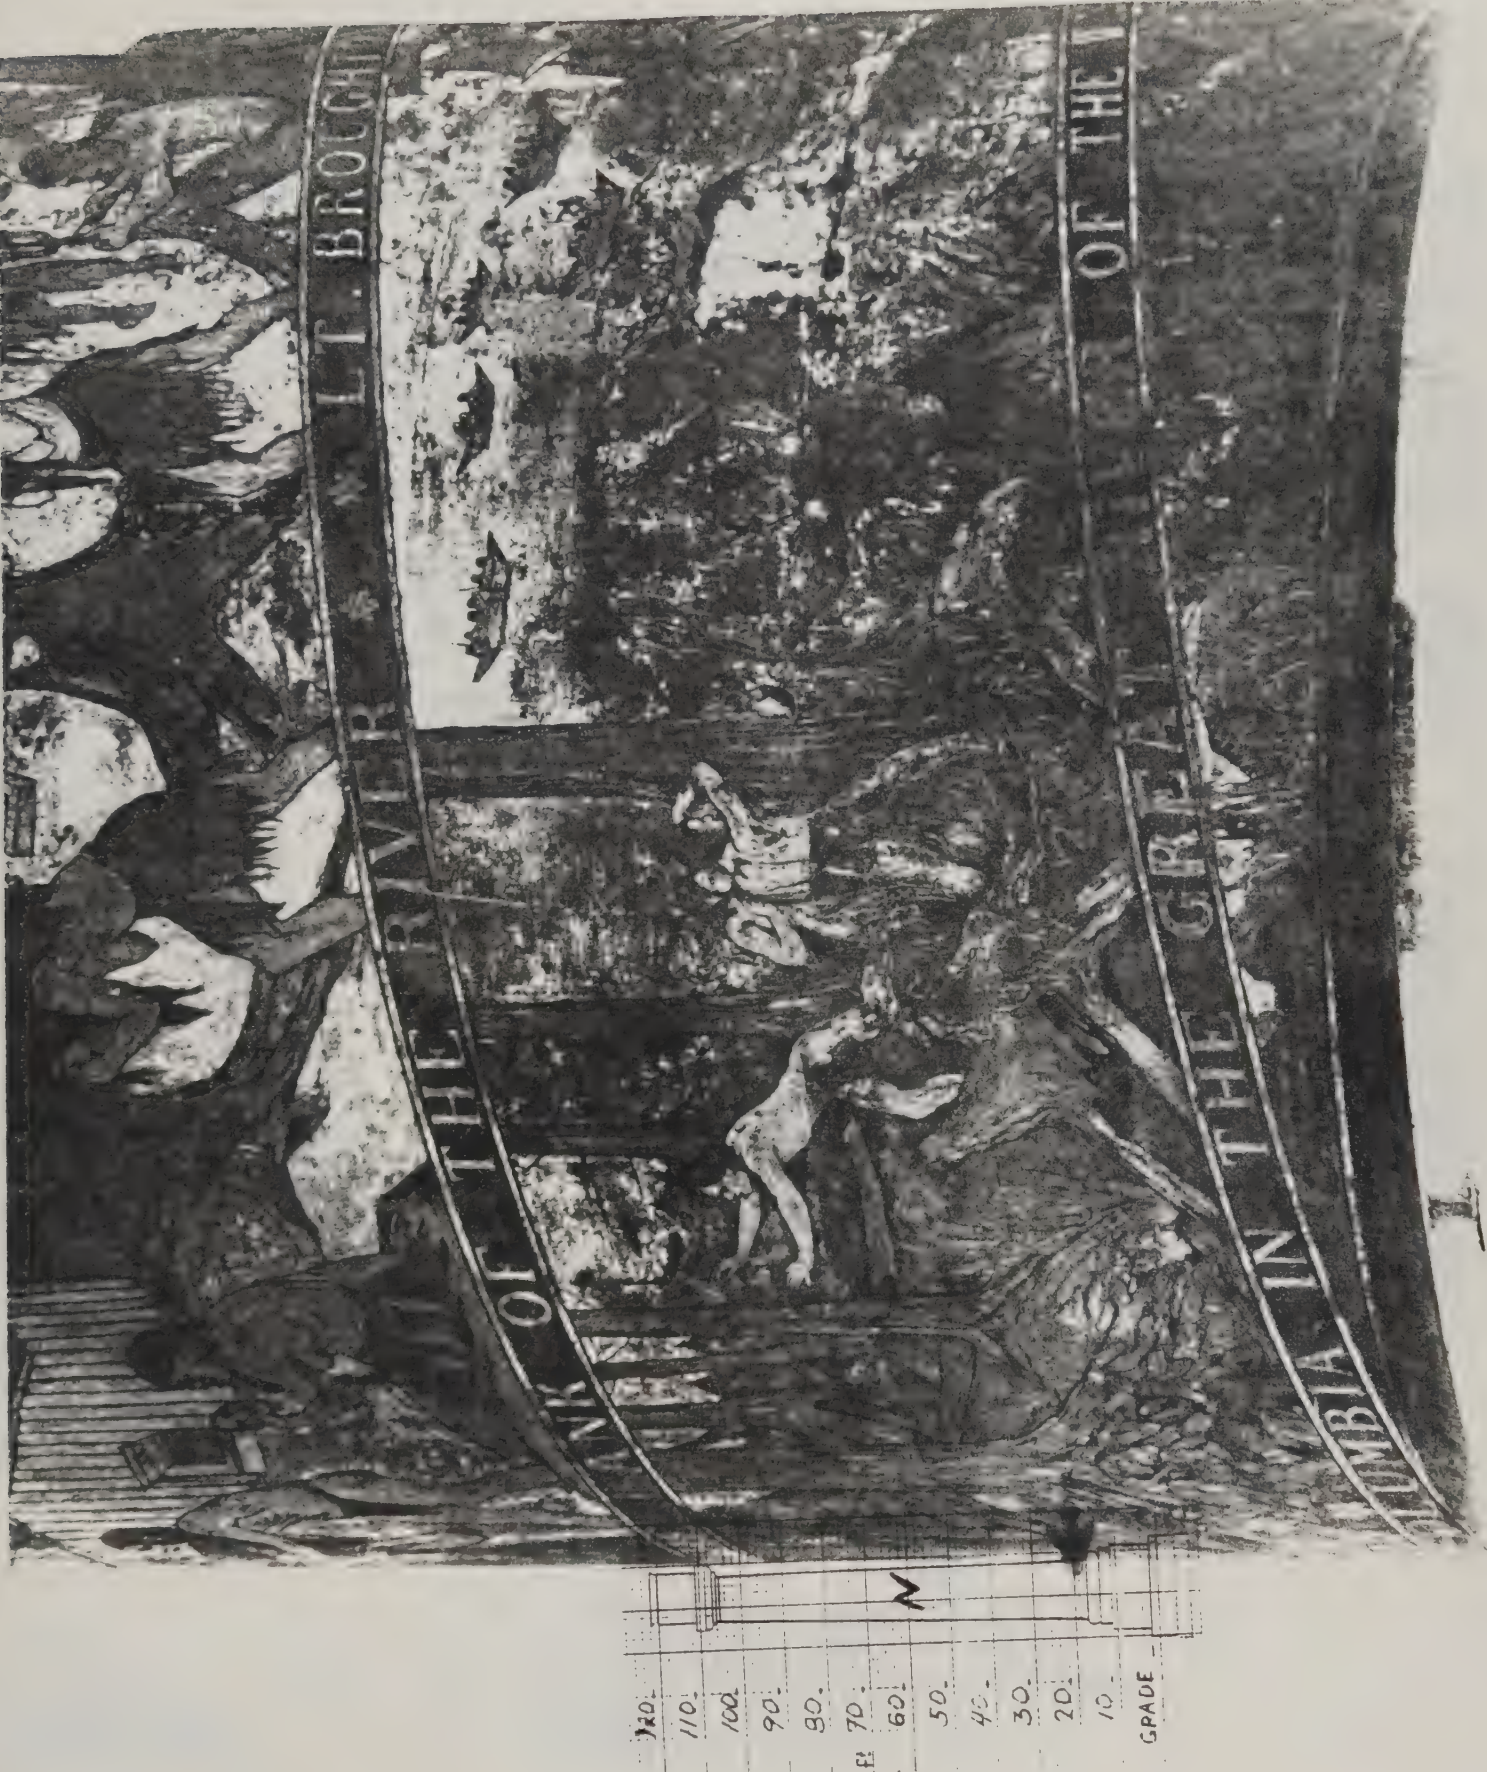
Photo Astoria Column North Face Section-OCT 1989
